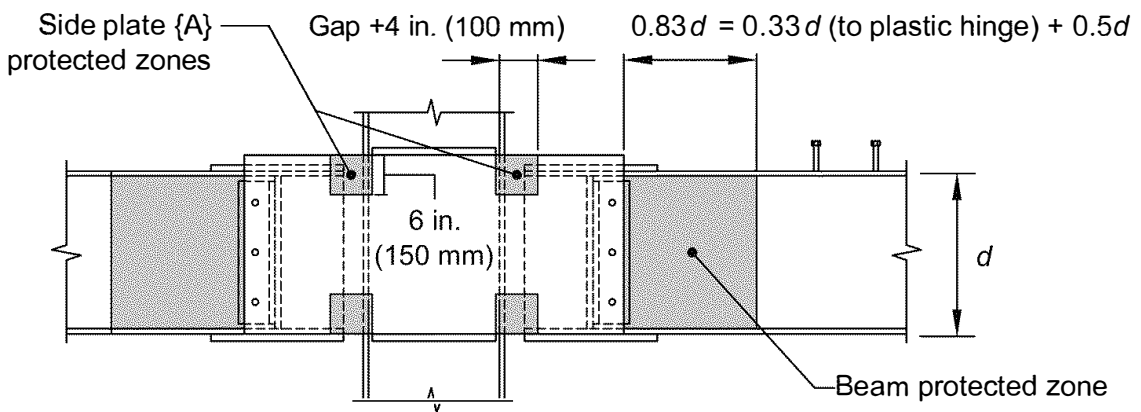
Location of beam and side plate protected zones (two-sided connection shown).
